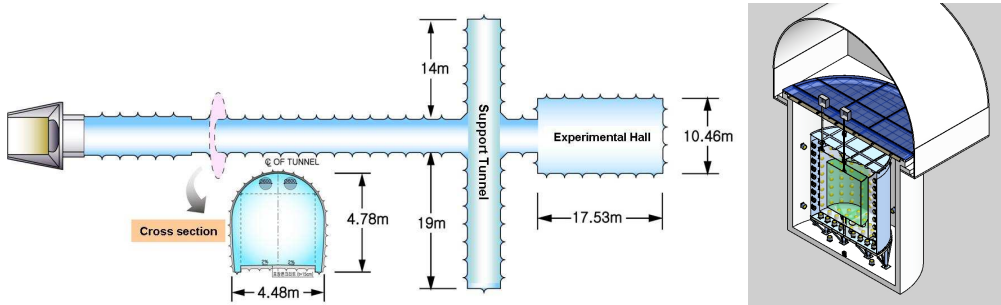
Plan of the access tunnel (top) and 3D schematic for experimental hall (bottom). The tunnels are constructed using NATM.
